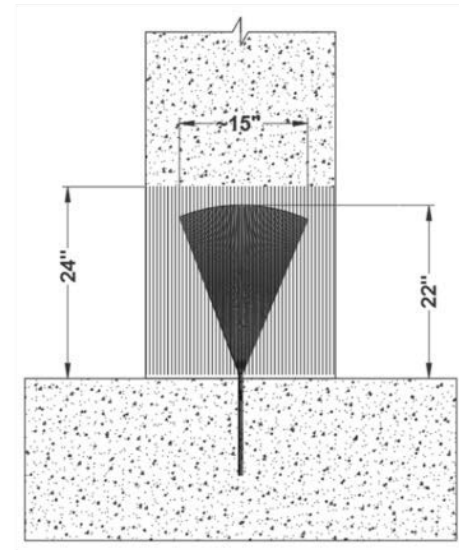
Detail of CFRP Anchor for C2 Column Specimen
